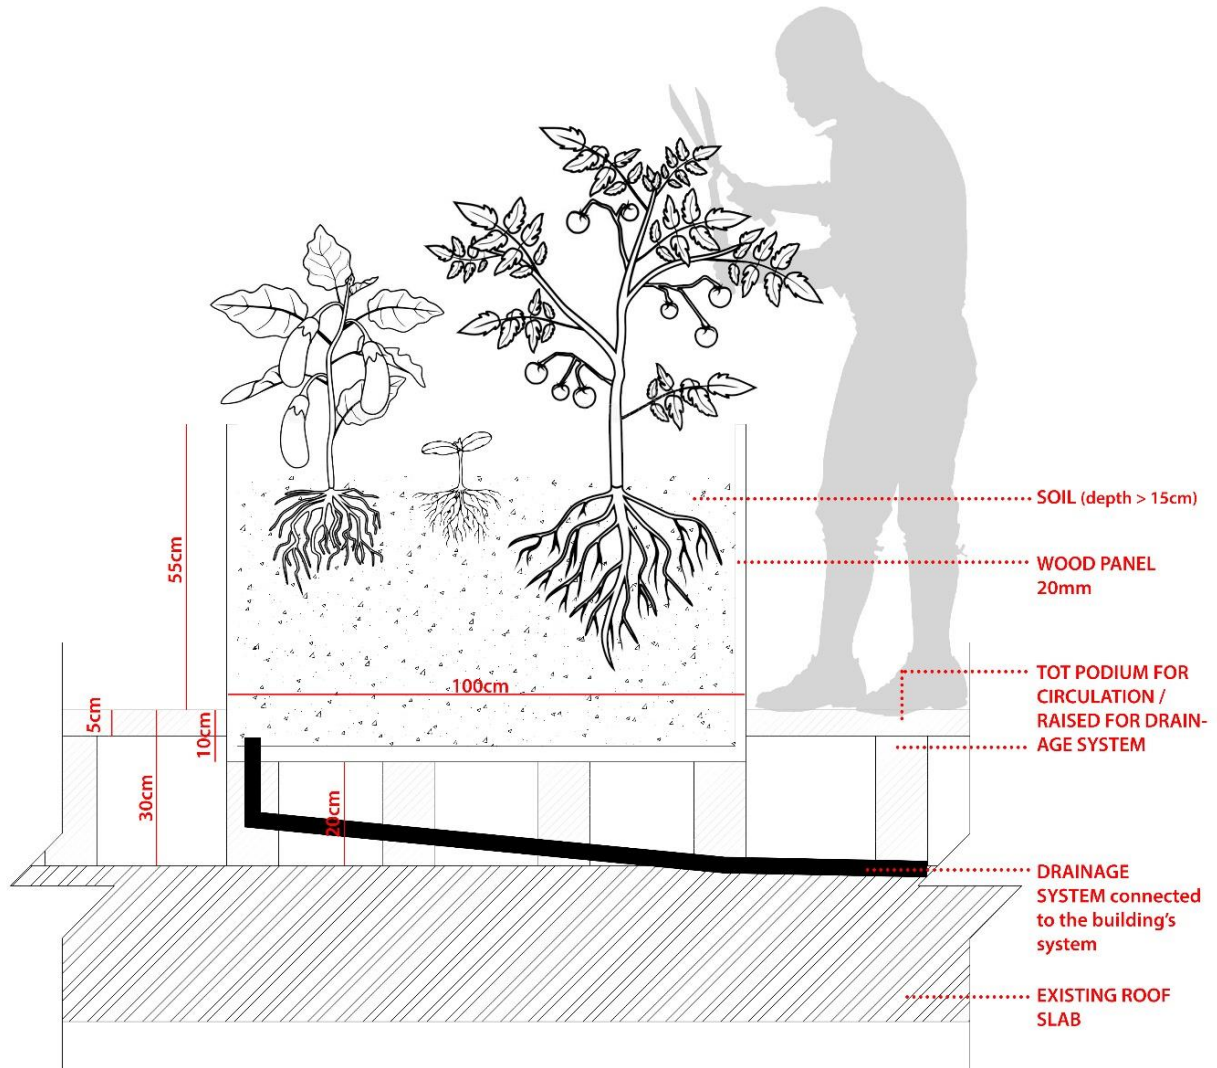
Module System for intensive green roof - section (Prepared by: author)
